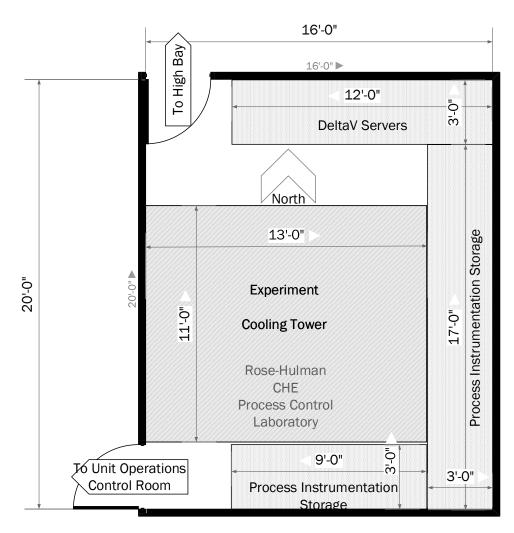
Process Control Laboratory (O-100A) Floor Plan
